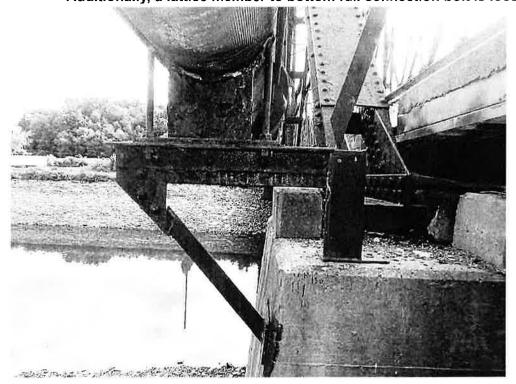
Steel utility support at the northwest pier, looking east - peeling paint and moderate rust.
